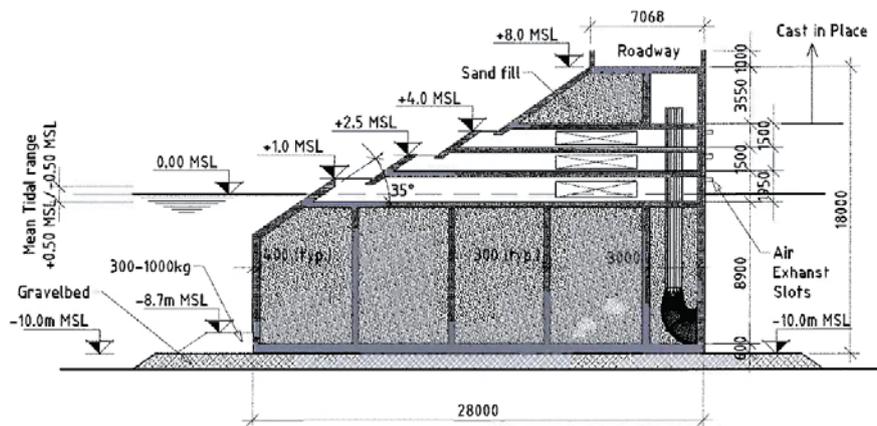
Section of the SSG-breakwater caisson at Swakopmund 11 m water depth (DMC 2008).
